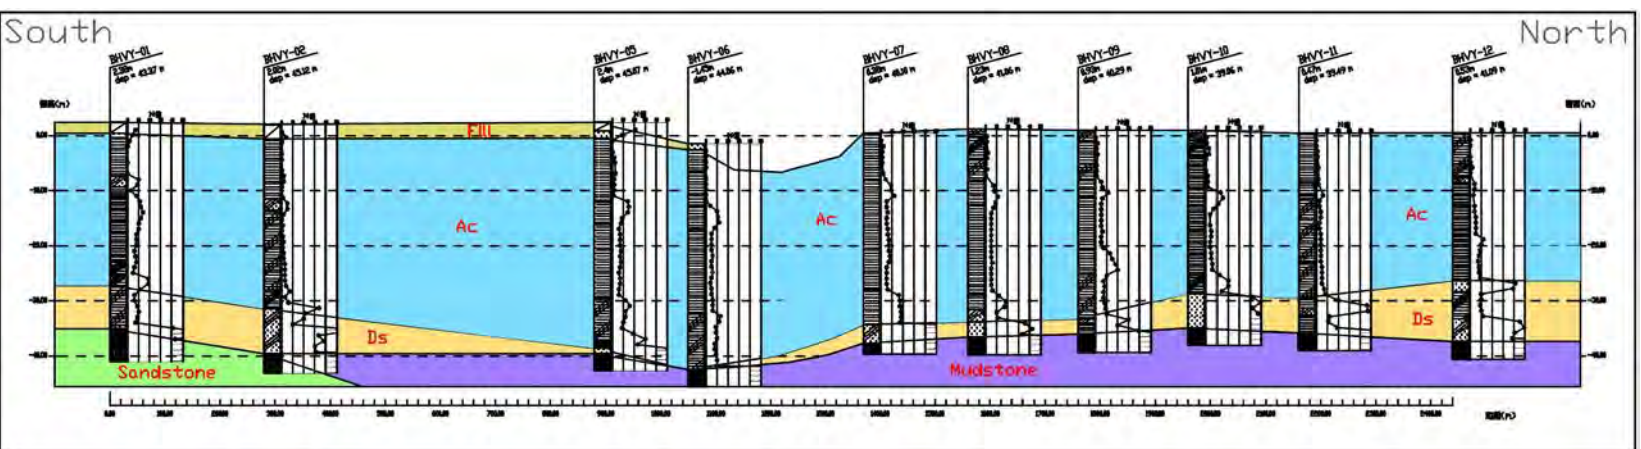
Soil Profile for Vu Yen Bridge Site (from VY-01 to VY-12)
